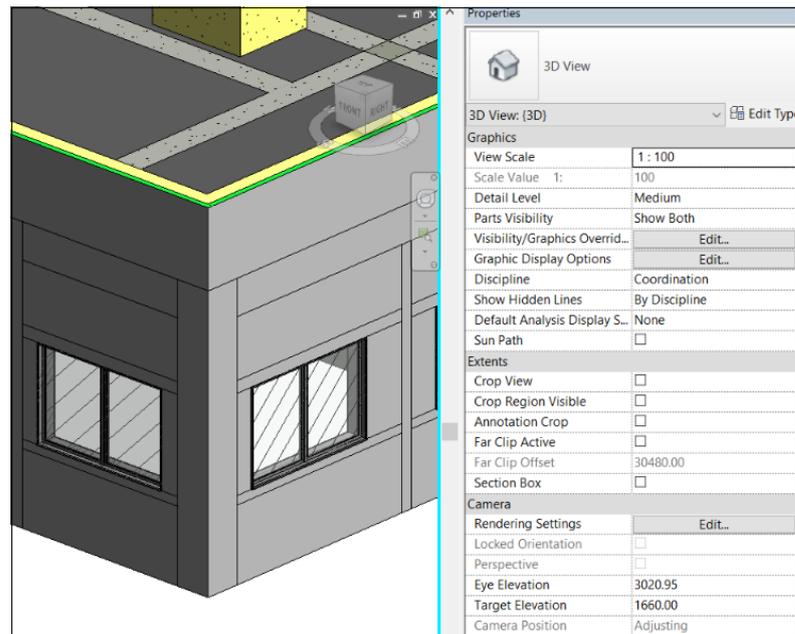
A Proper Joint of Insulation Elements in 3D Plan
